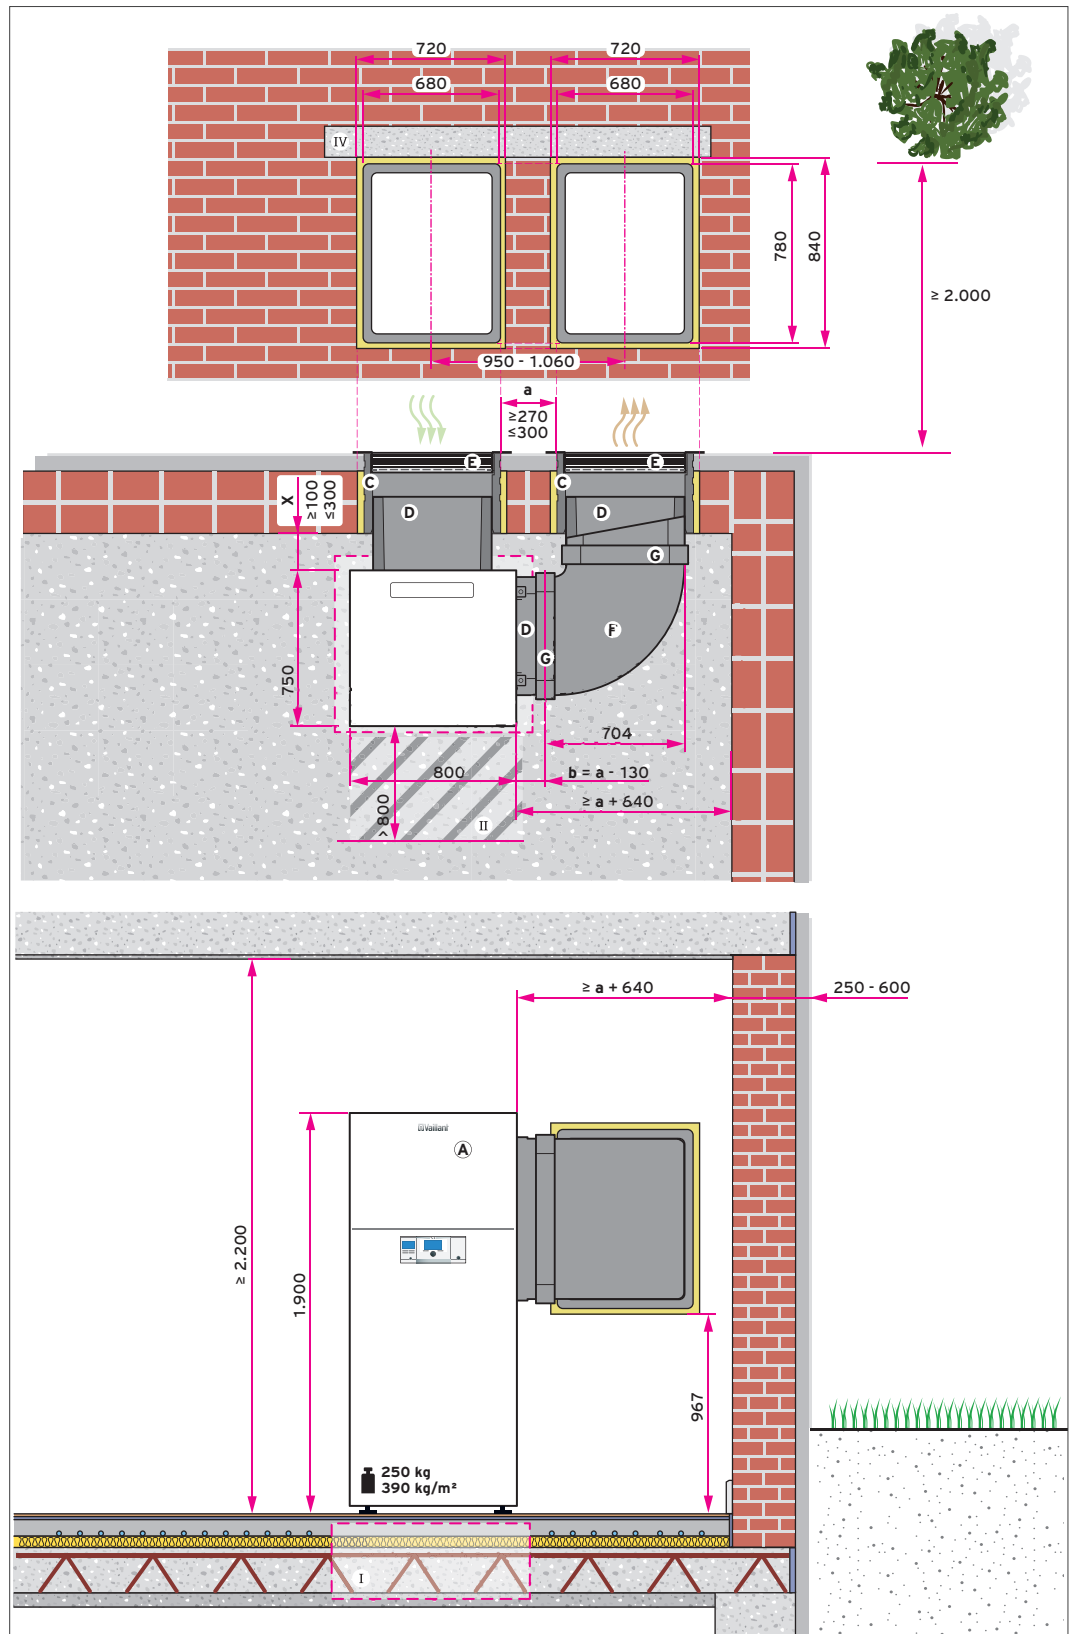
versoTHERM installation situation, ground floor - air intake at the rear
